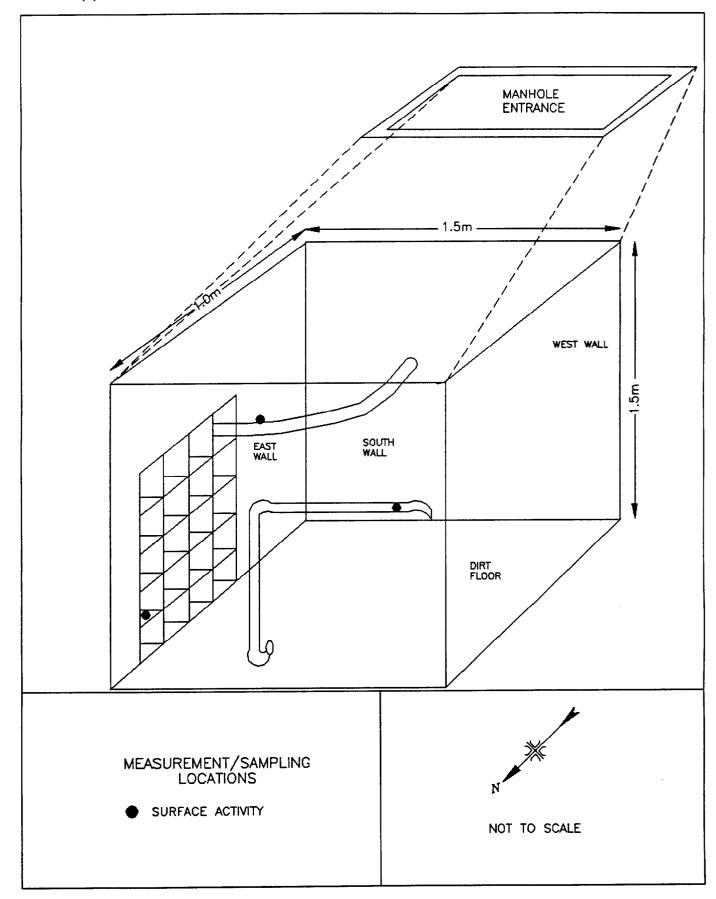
Building 3, Pipe Chase Manhole — Measurement and Sampling Locations
